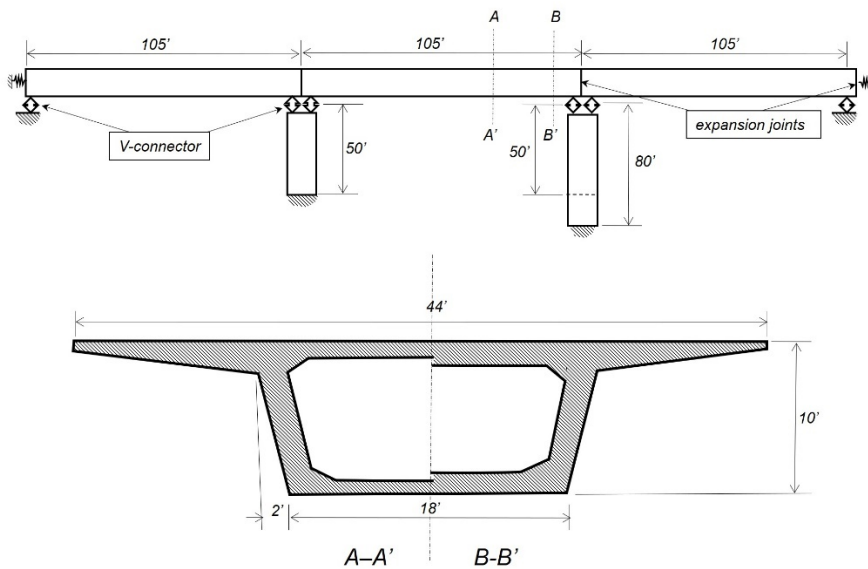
Benchmark railroad bridge I: three-span simply-supported precast concrete box-girder bridge. To reduce the stress peak in areas around bearings locations, thicker box wall has been designed at B-B section, although the bending moment here is lower than section A-A.
